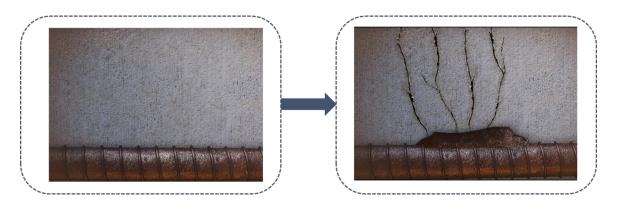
Bridge failure due to rebar deterioration
